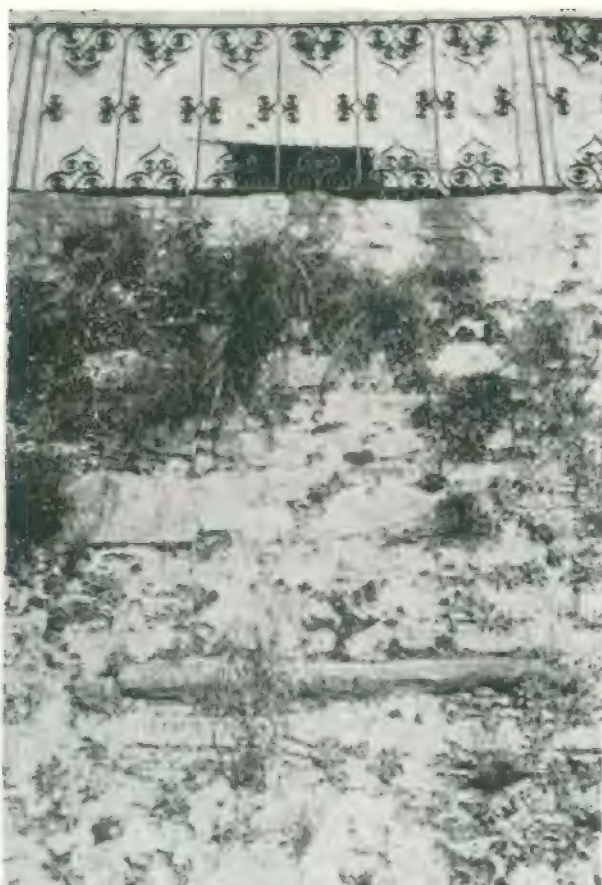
TOWER OF ST. SAVAS. WALLED-UP OPENING ON THE OLDER WALL, OUTSIDE THE TOWER'S ENTRANCE (1987)
